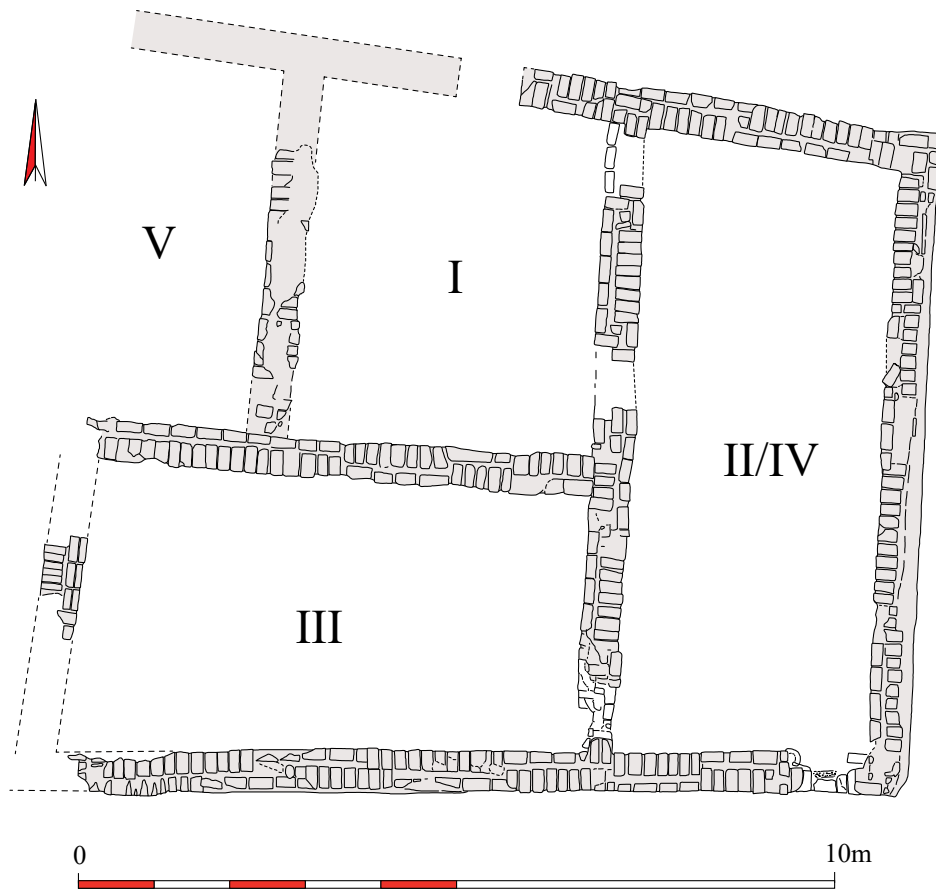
Building 1, Period 2, Phase 1 (scale 1:100).
